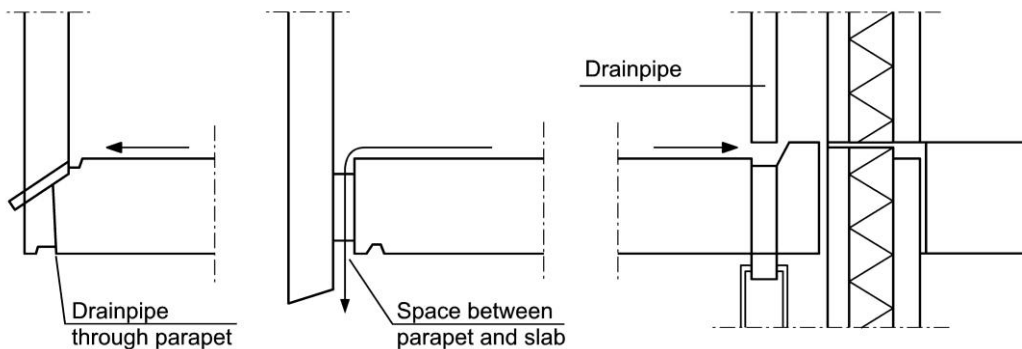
Different balcony drainage methods. From left: Pipe through parapets, gap behind parapet and drain pipe in the corner.
